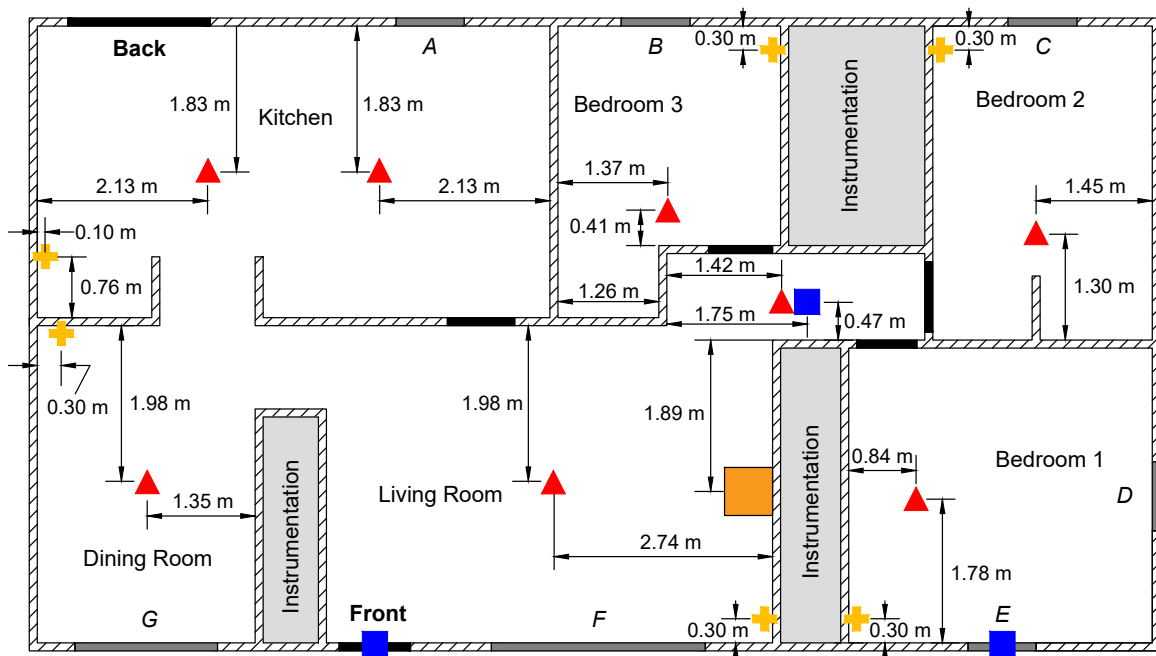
Dimensioned plan view drawing of instrumentation in the single-story structure
